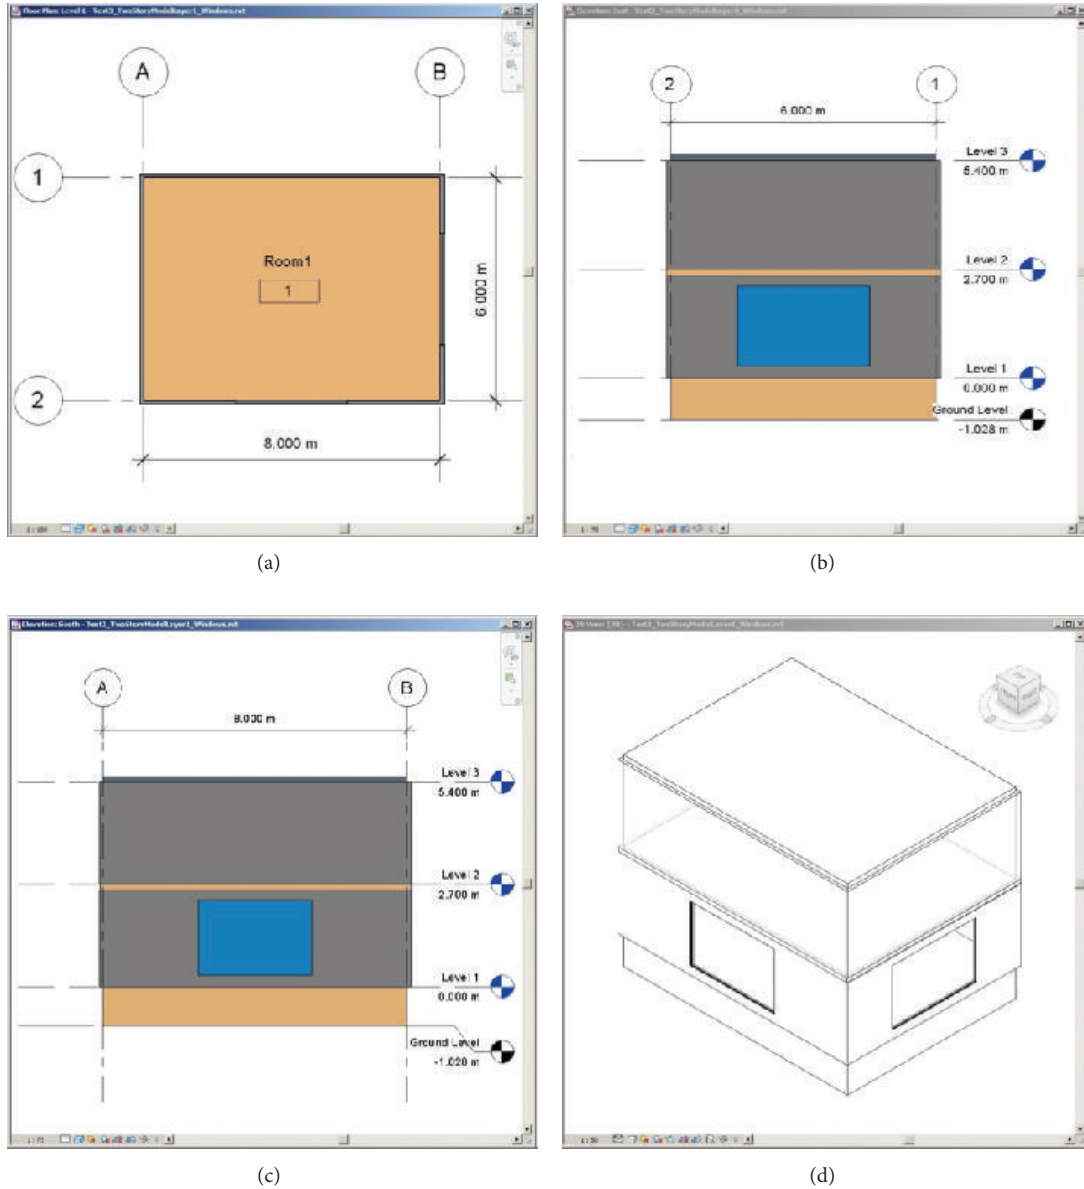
A two-story Revit model. (a) Floor-plan view of first level, (b) East-elevation view, (c) South-elevation view, and (d) isometric view.
